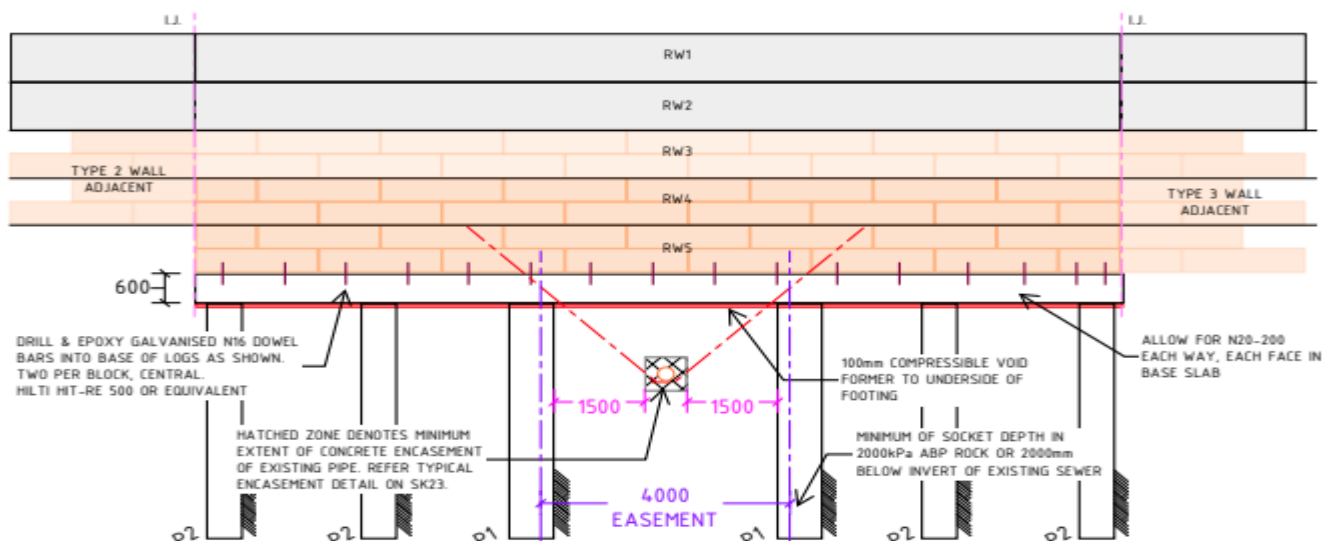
Extract from Retaining Wall Section 3 (Northrop, 2025)
